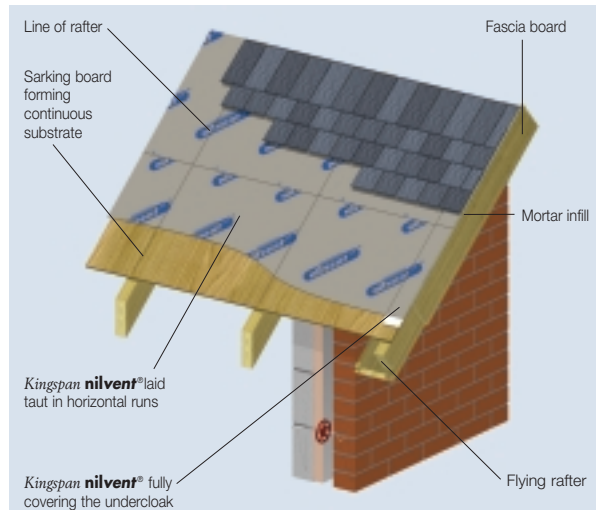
Verges – Fully Supported Horizontal Installation with Natural Slates
